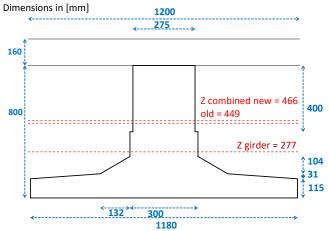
Cross-section HIP girder from Span Beton [11], adapted. Sizes in [mm].
